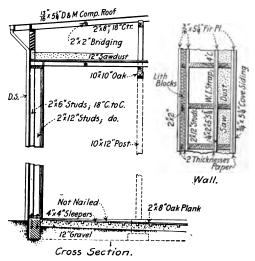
Ice House with Mineral Wool Insulation, C. B. & Q. House, Galesburg.
